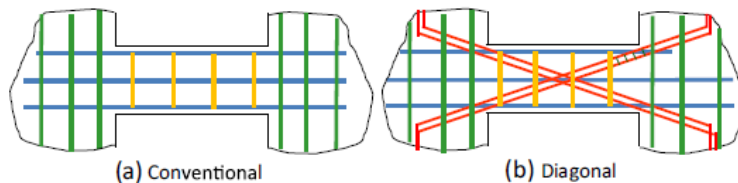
Reinforcement layouts (Gaochuang et al., 2016)
